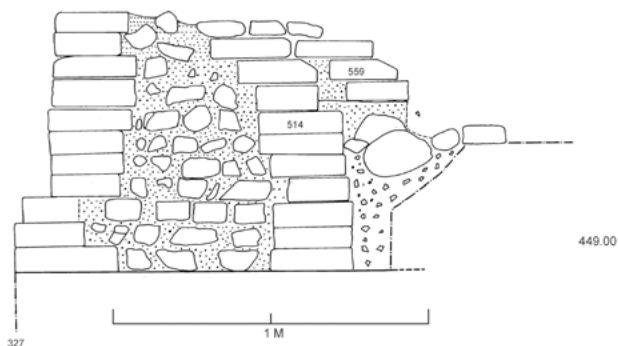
East-west section through wall 514 showing extra face 559/1213.
